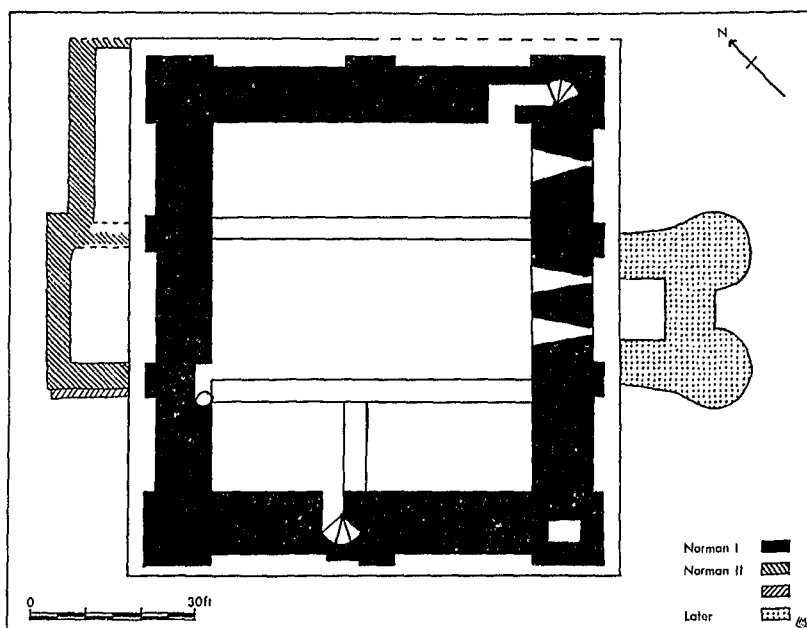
Ground floor plan of the keep of Canterbury Castle showing the foundations of the original forebuilding excavated in 1971 and the foundations of the later forebuilding excavated by G. Webster in 1939. Based on the plan in D. F. Renn, *Norman Castles in Great Britain*, London and New York, 1968.
